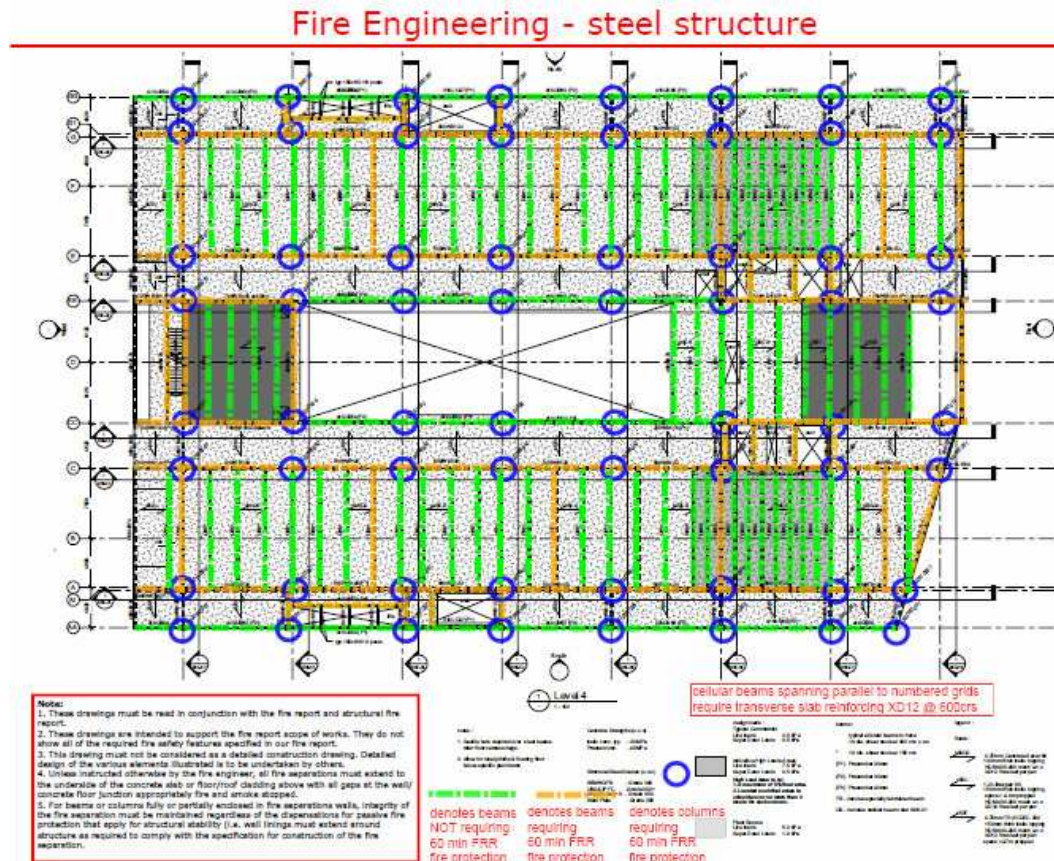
Passive fire protection to steel beams for a typical floor – Britomart East building
